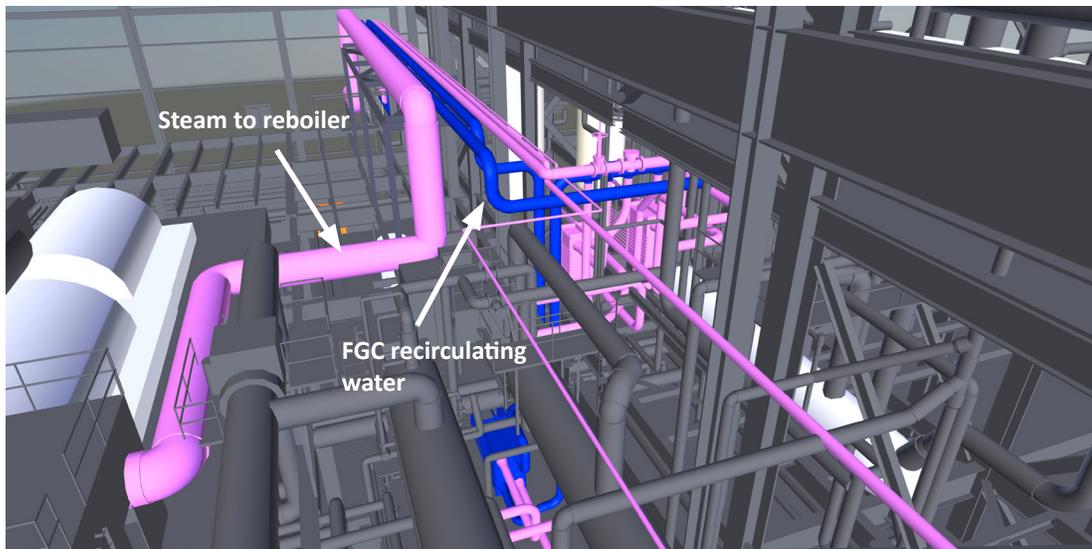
Proposed design and location of the FGC recirculating water line (highlighted in blue with the north wall, operating floor and existing piping and steel hidden)
